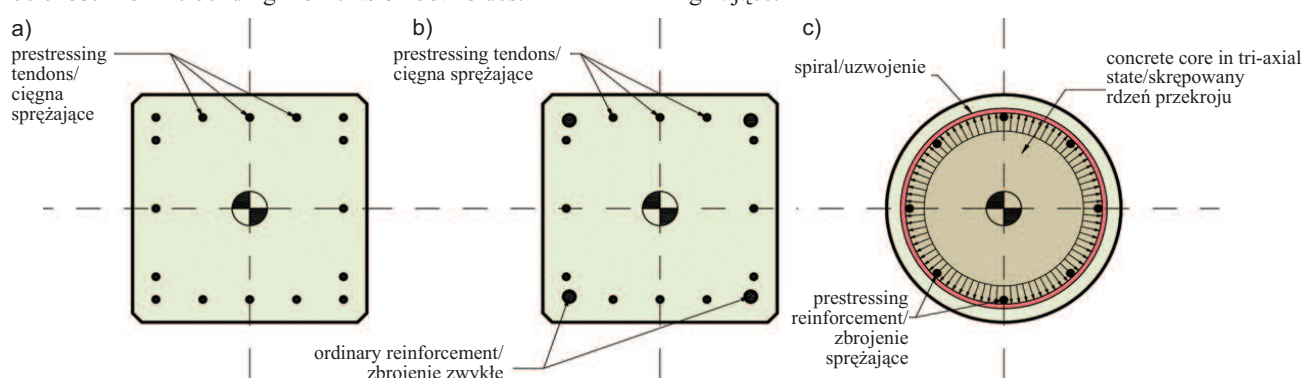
Prestressing reinforcement arrangement: a) fully prestressed; b) partially prestressed; c) active confinement
